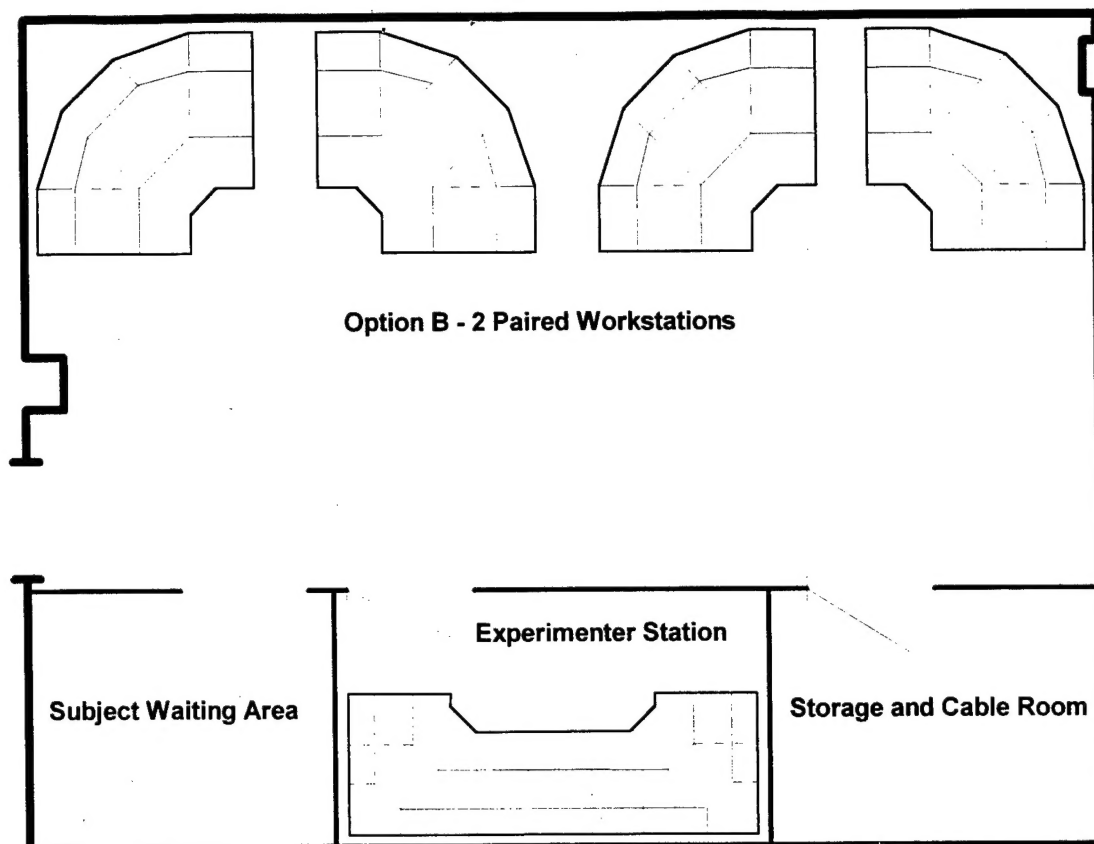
CERTT Floor Plan - Console Layout Option B *(drawn to scale)*.
